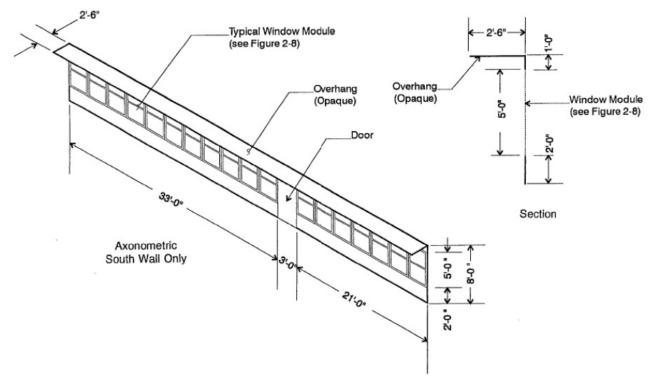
Case L155A South Wall with Overhang (ANSI/ASHRAE 2011, Figure 7-13)
